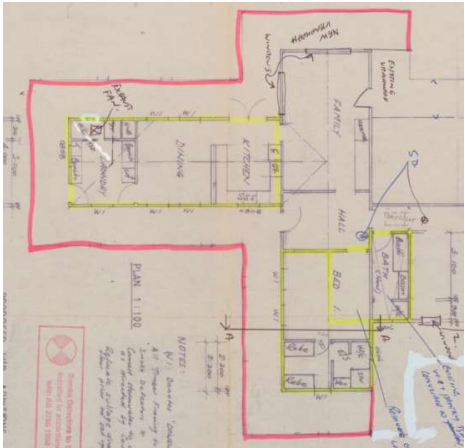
Extension as carried out, with new walls highlighted yellow and new parts of the verandah in red. (Shire of Buninyong, Building Approval No. 4977)
